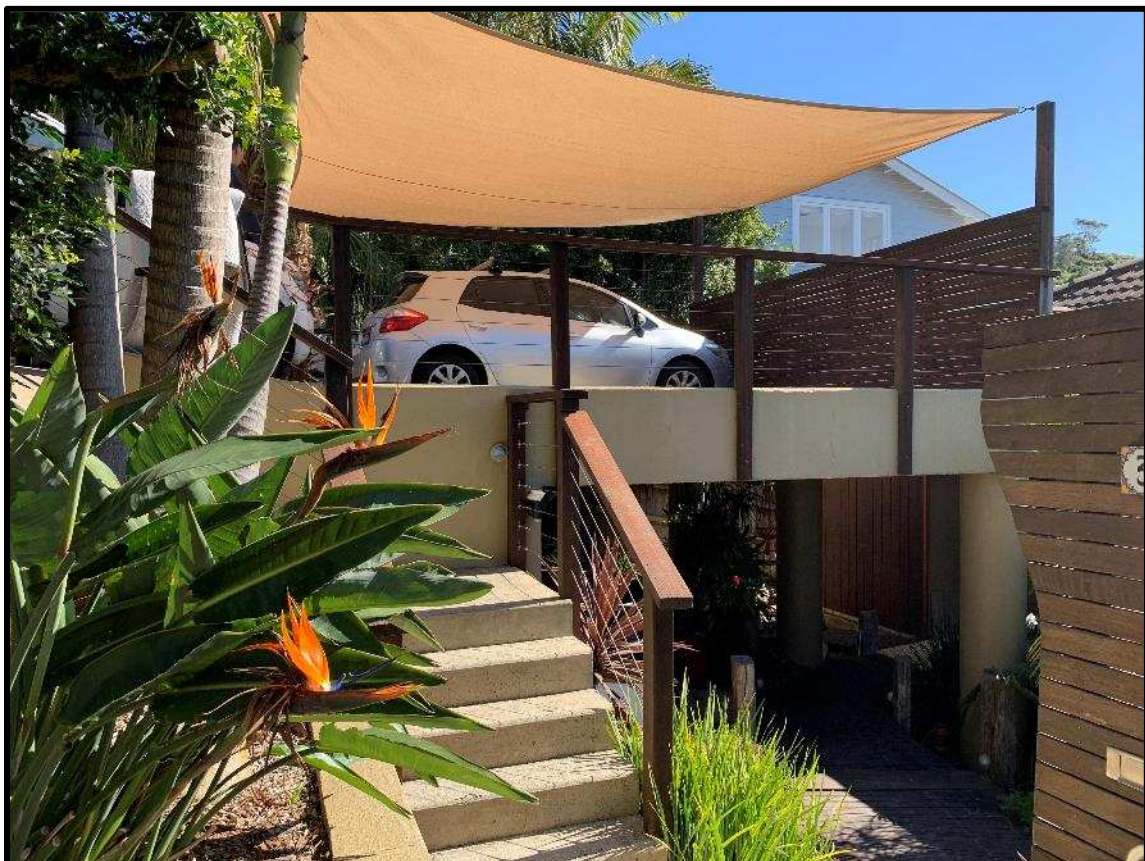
View of stairs leading to residence from carport and support piers for carport.
